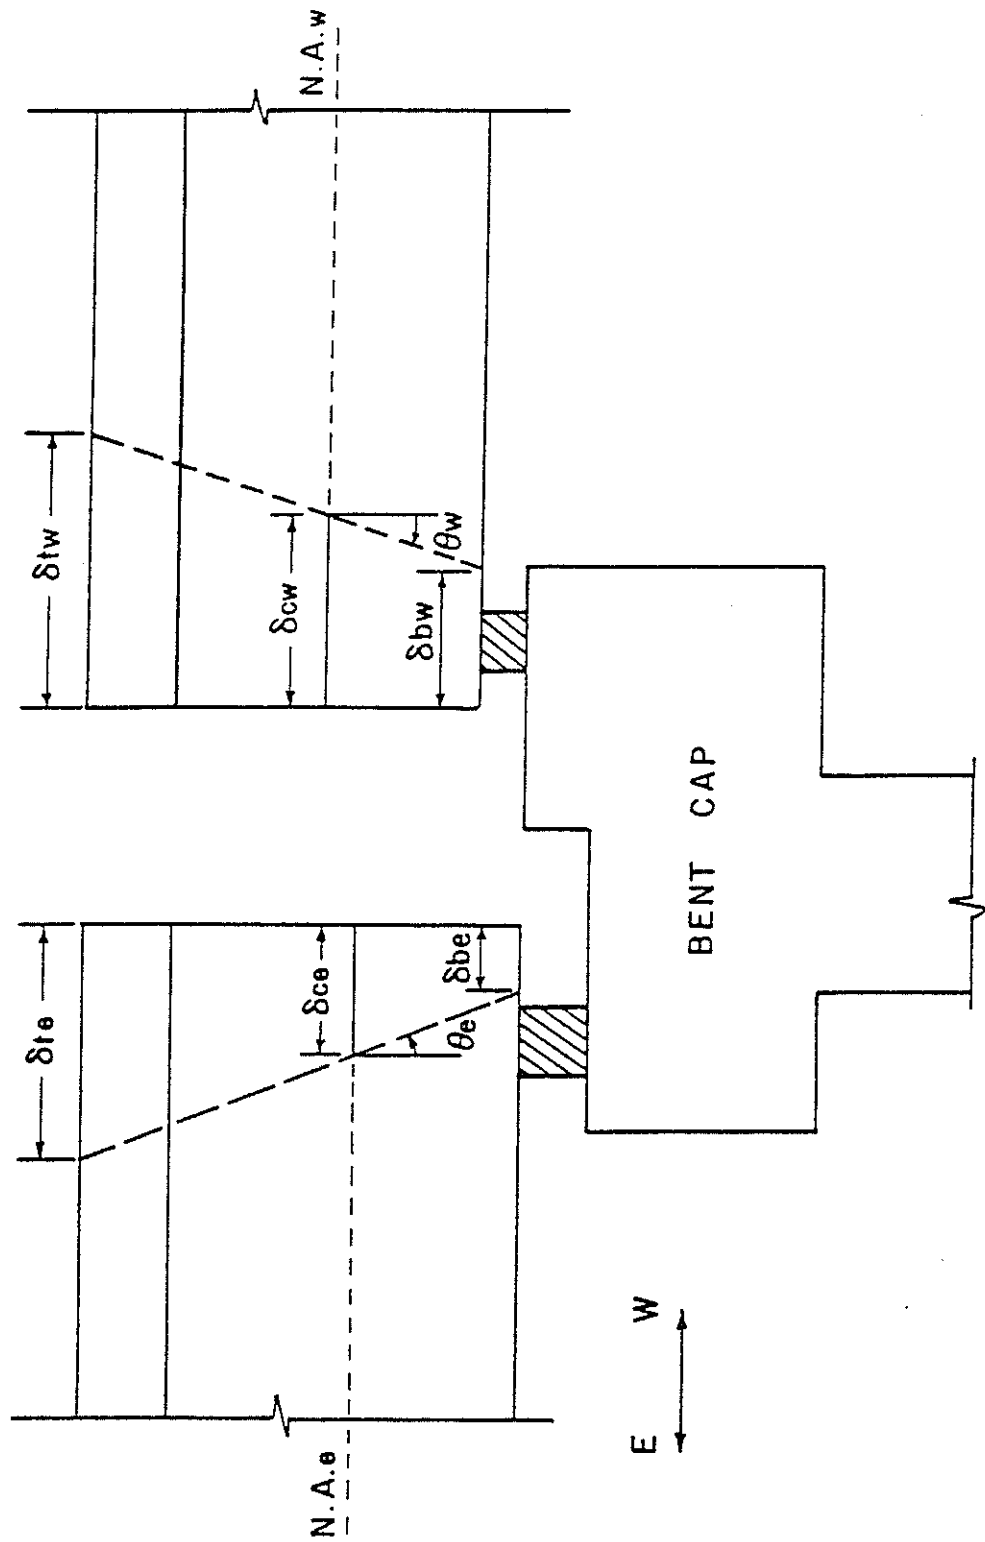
North Elevation of a Typical Expansion Joint, other than the Abutment, Before and After Longitudinal Movement.
